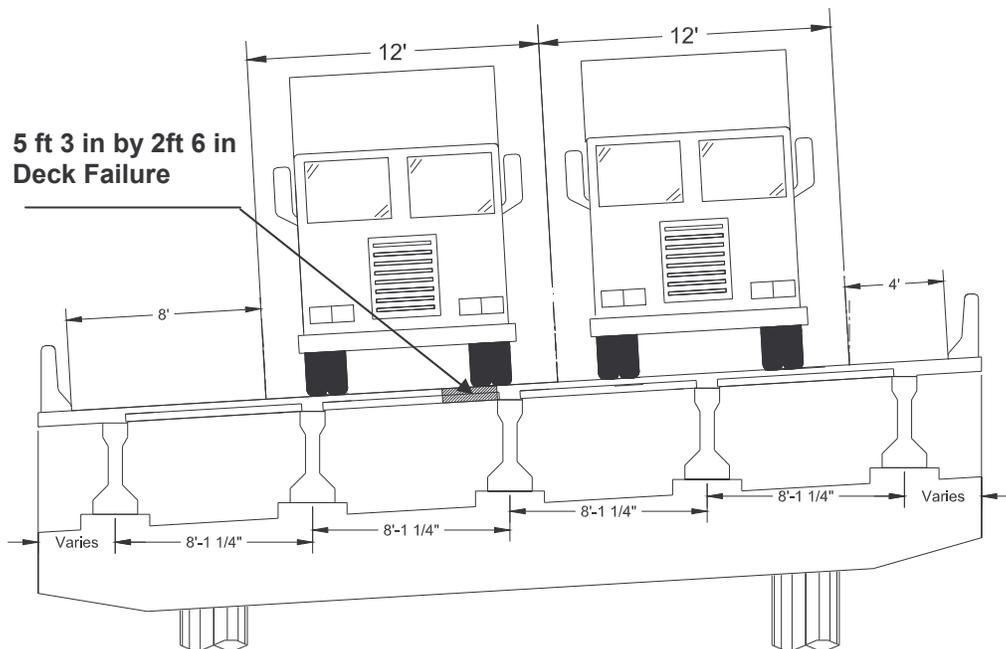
Cross Section View of Bridge # 100332, Span 38
